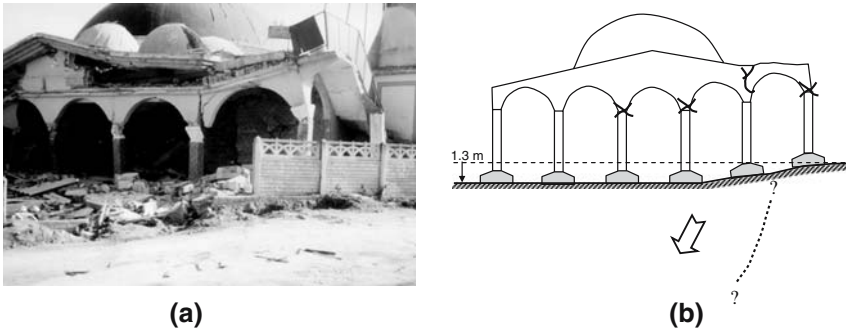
Mosque; Collapse: (a) photograph of the Mosque showing the differential settlement of the un-scarped ground surface and the distress of its superstructure, and (b) sketch of its cross section and foundation (separate footings)
